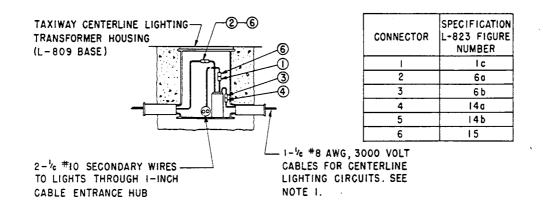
WIRING DETAILS FOR TYPE L-852 AND L-842 FIXTURE ASSEMBLIES.
